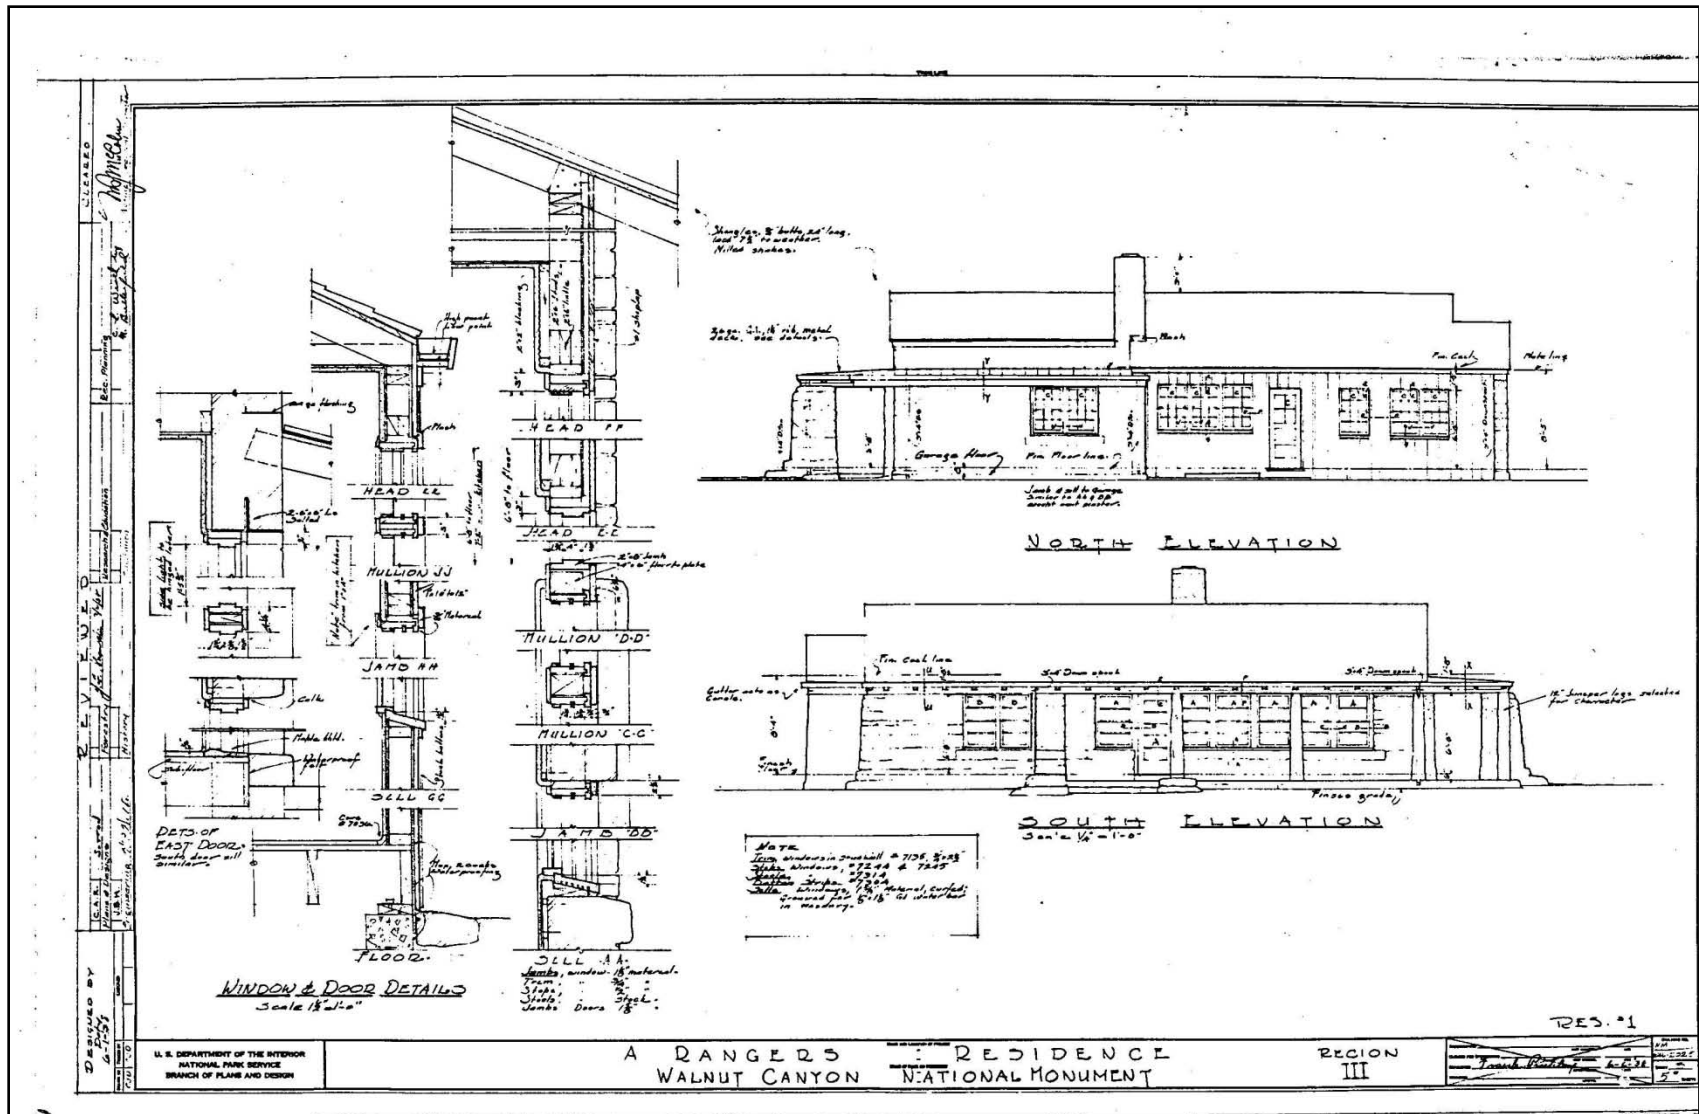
Building plan for Residence No. 1, north and south elevations, (NPS Dwg NM-WAL 2025, sheet 3), 1938, drawn by Cecil Doty.
